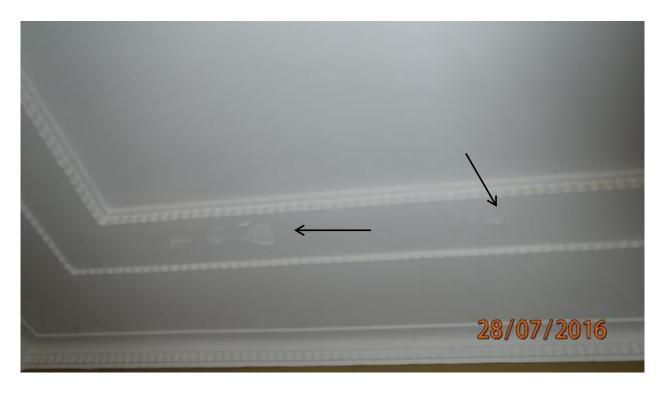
shows separation cracking to the wall/cornice junction in the Sunroom.
